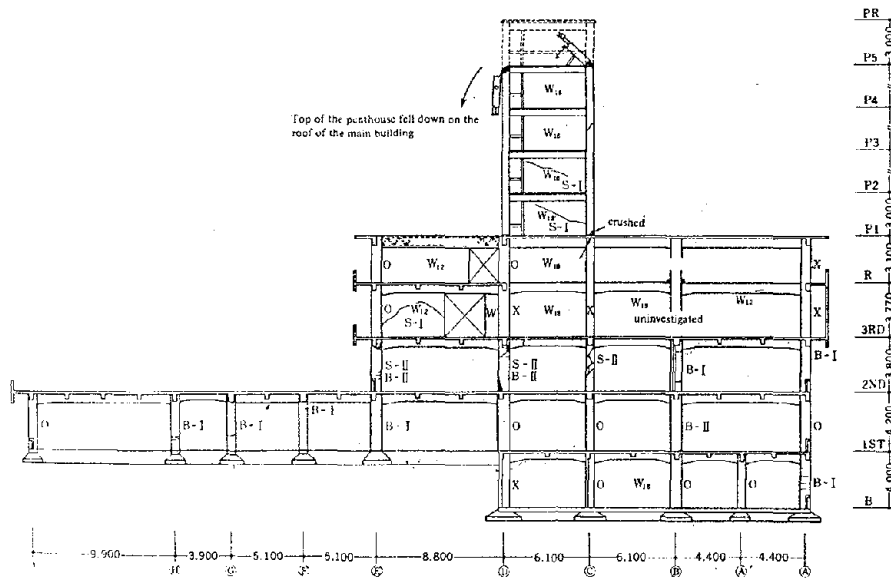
New reinforced concrete city hall, Hachinohe.
